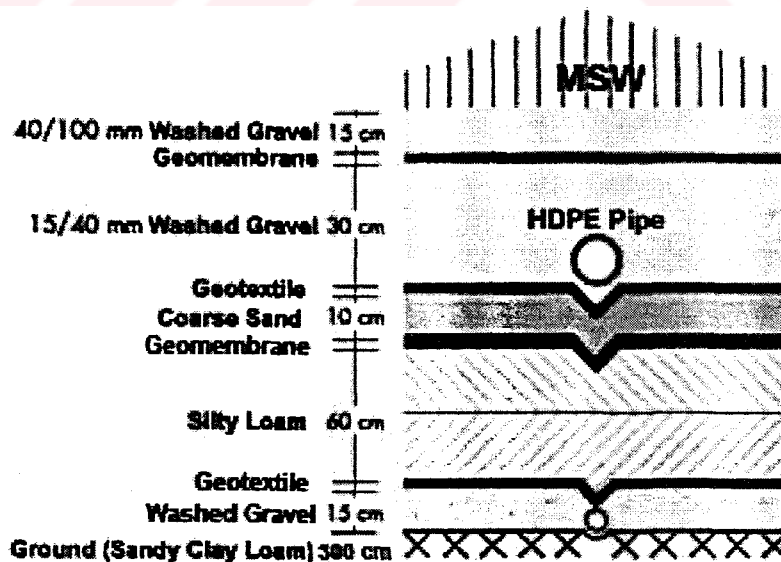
Typical MSW lot cross section for İZAYDAŞ landfill site.
